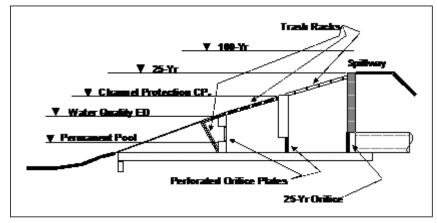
Schematic of Orifice Plate Outlet Structure
